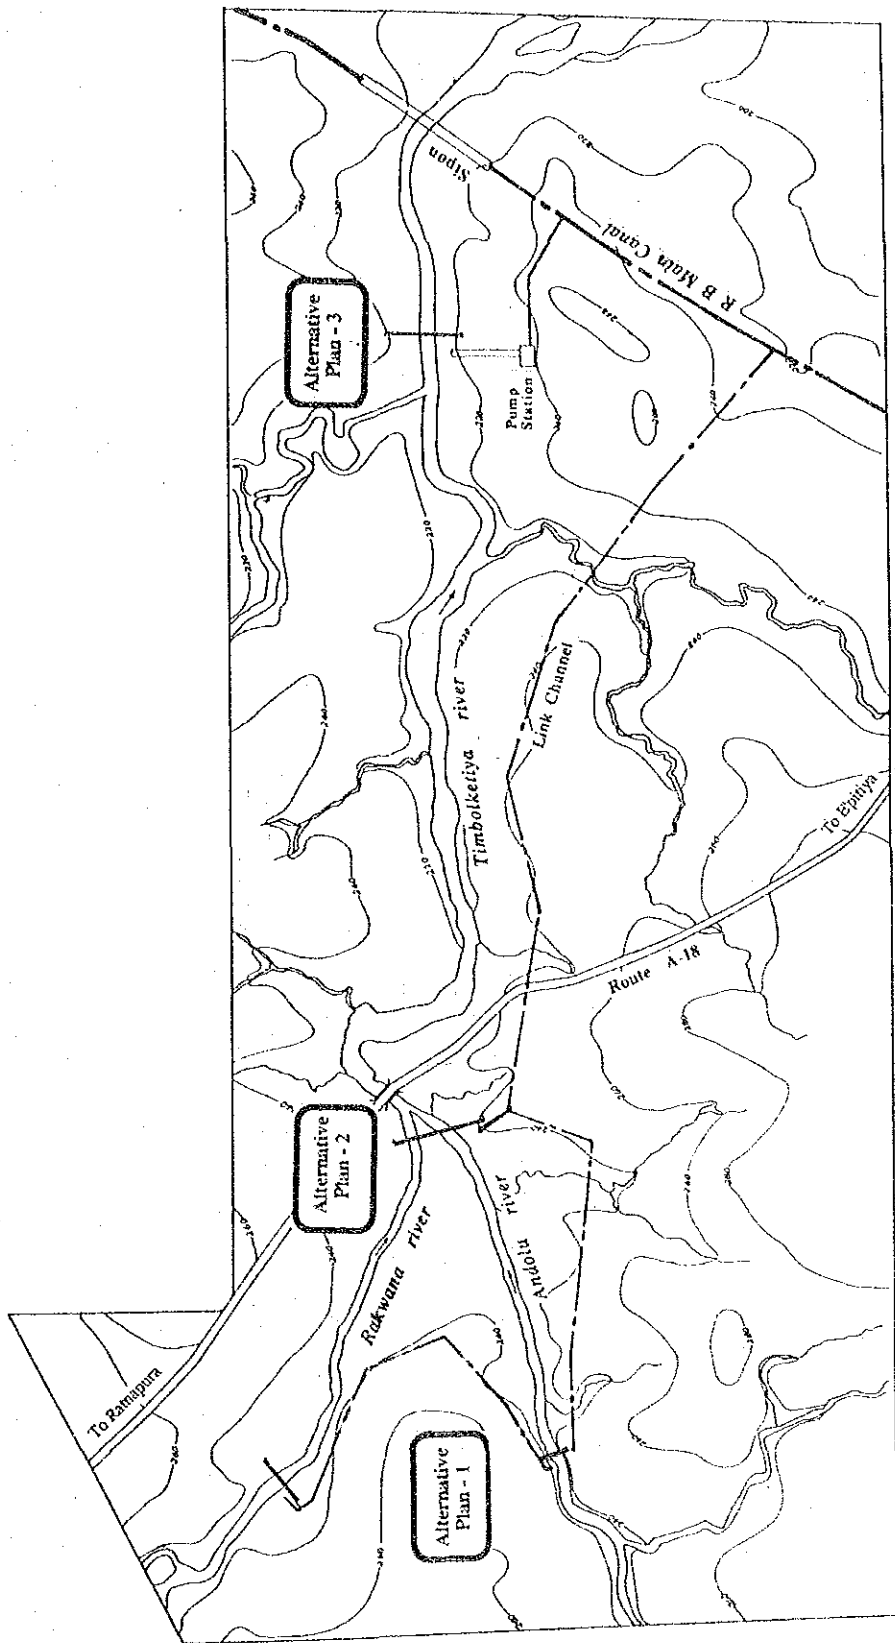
ALTERNATIVE FACILITY PLANS ON THE TIMBOLKETIYA RIVER
